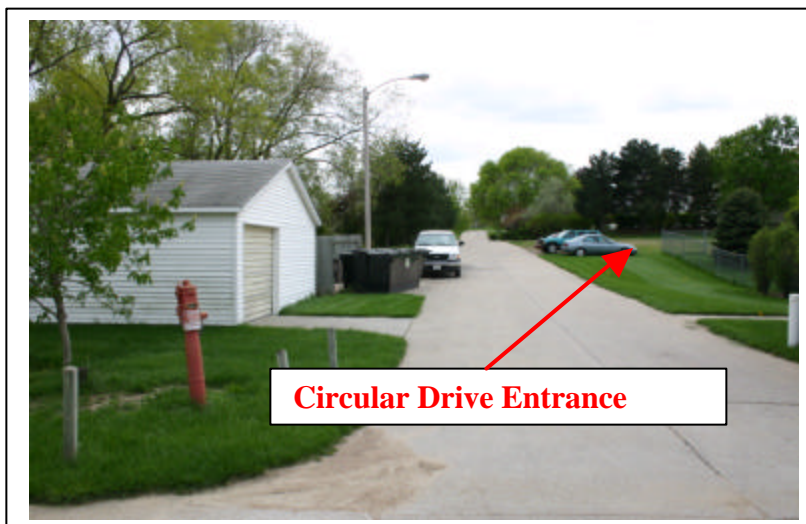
Southwest Corner of Nursing Home looking southeast.
